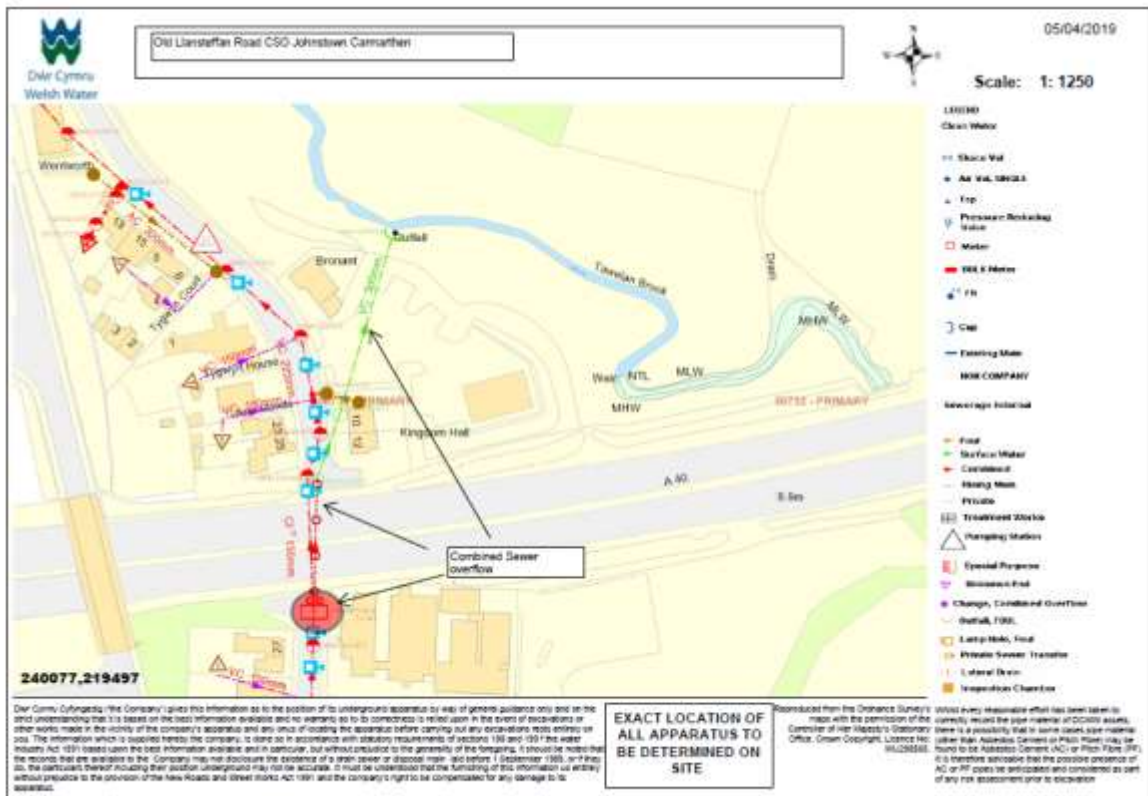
Map of the highway drainage at Llansteffan Road, Johnstown
